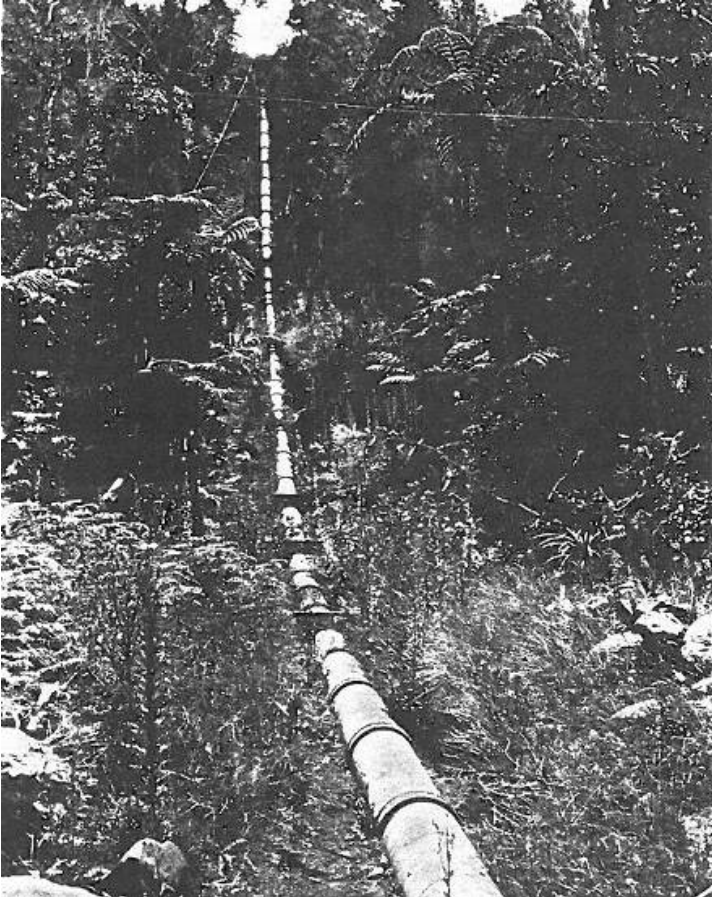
The concrete pipes that ran down from the headgate to the powerhouse (BOIEPB)
